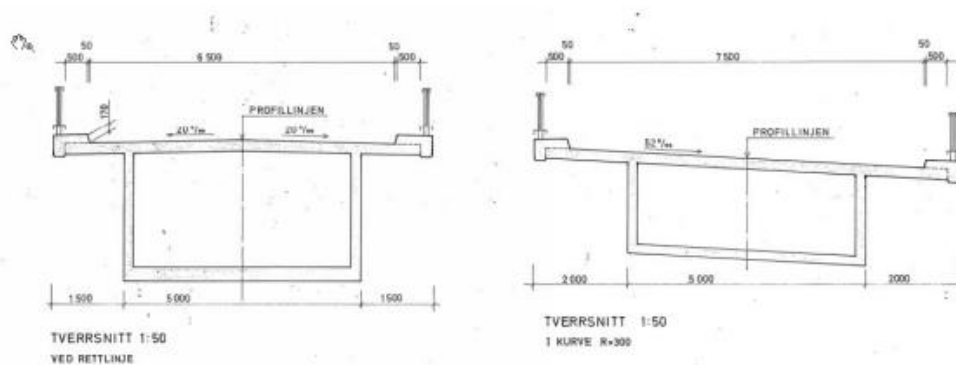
Cross section of existing Kjøkøysund Bridge [72]
